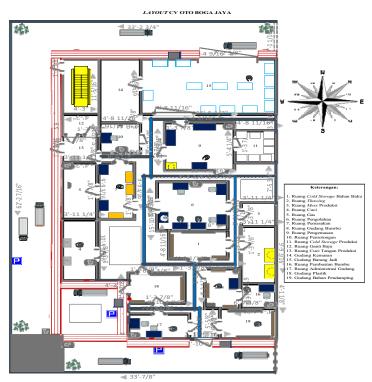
Floor Plan Alternative Layout 2 (Choosen)
